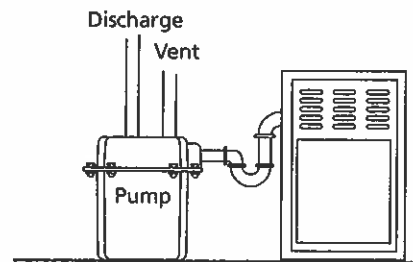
Typical installation to remove air conditioner condensate or dehumidifier water
